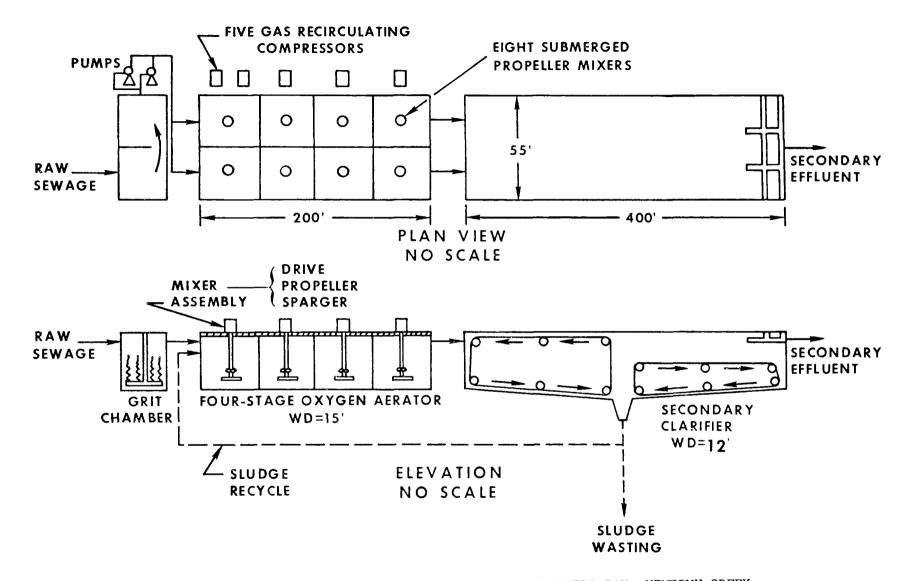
PLAN AND ELEVATION VIEWS OF OXYGEN AERATION TEST BAY, NEWTOWN CREEK
